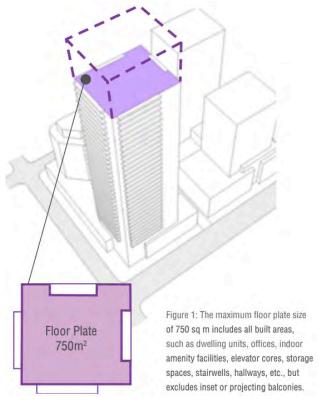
Floor Plate Size and Shape Diagram (Source: City of Toronto Tall Building Design Guidelines, 2013)
